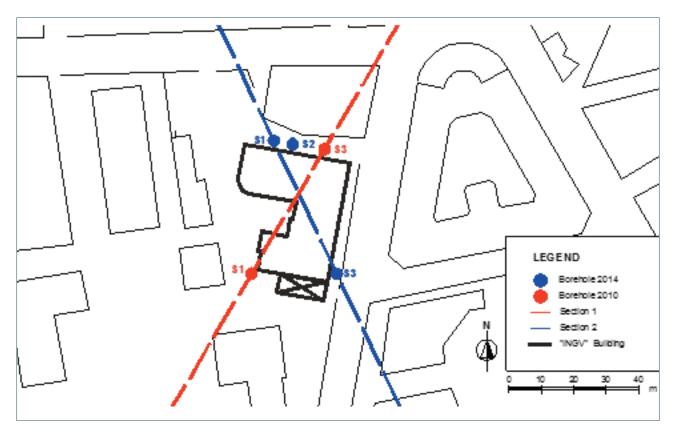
Plan view of geotechnical cross sections developed from site investigation results [after Capilleri et al., 2016, modified].
